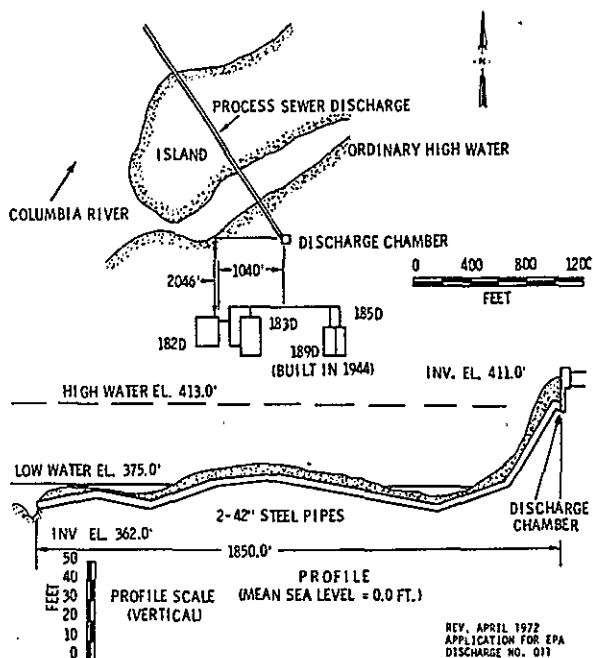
D-12 RESEARCH FACILITY AND BACKWASH DRAIN, 100-D AREA
